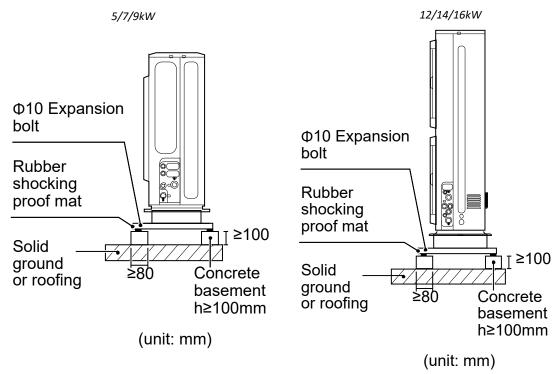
Outdoor unit typical concrete base structure design (unit: mm)
